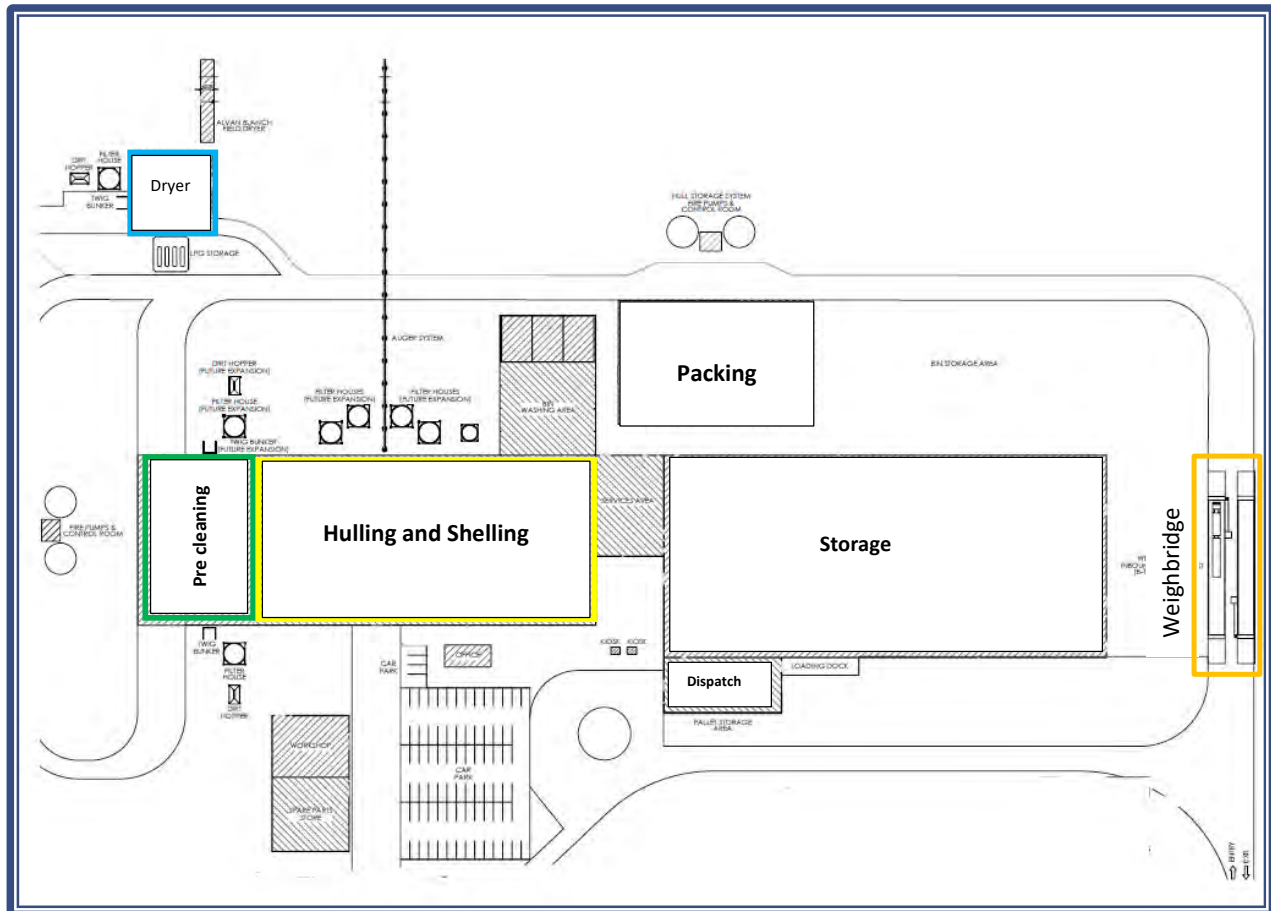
Plan showing Shelling and Hulling Overview (Source: JMA Engineering Plans – Sheet A102)
